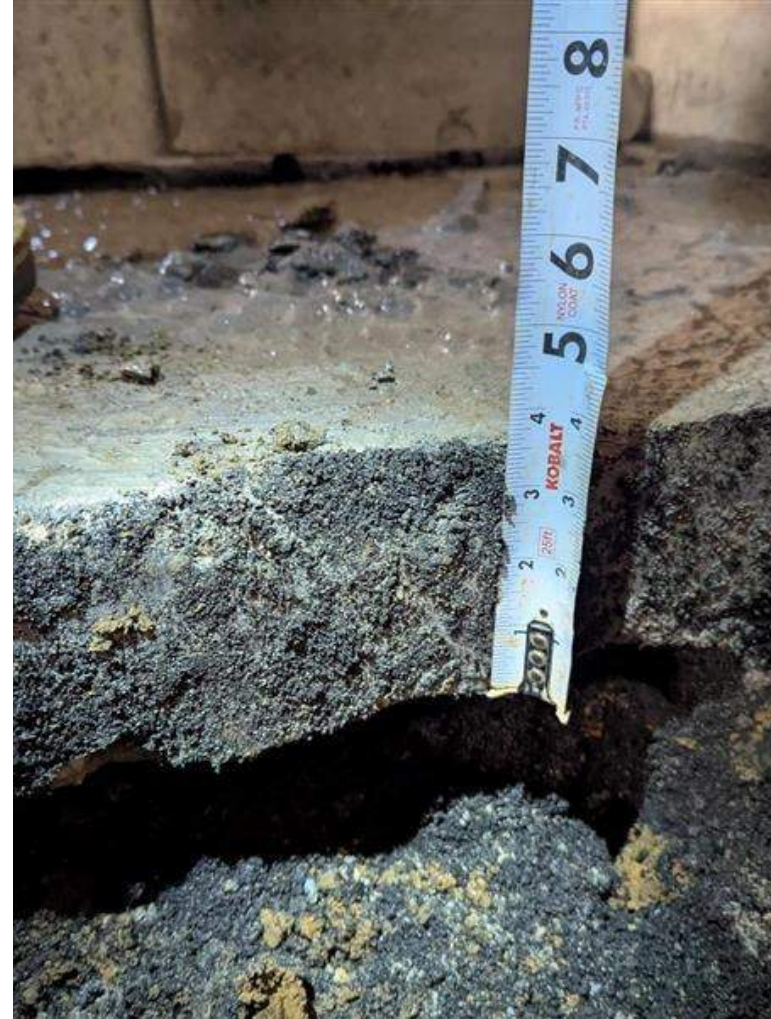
Interior Test Pit TP-3A; view of foundation projection
